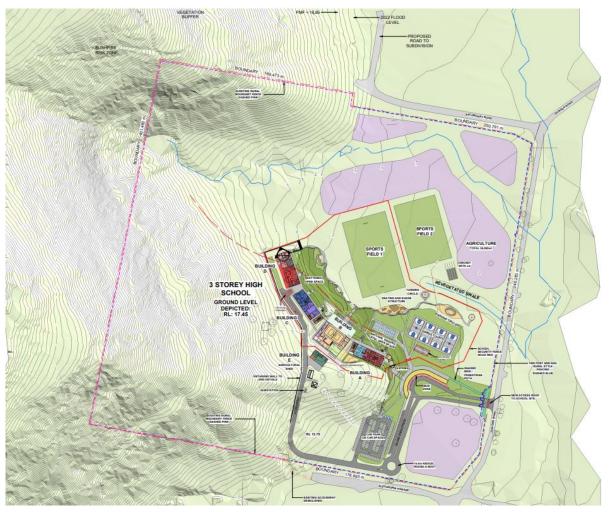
Overall Site Context Plan (Source: EJE Architecture)
